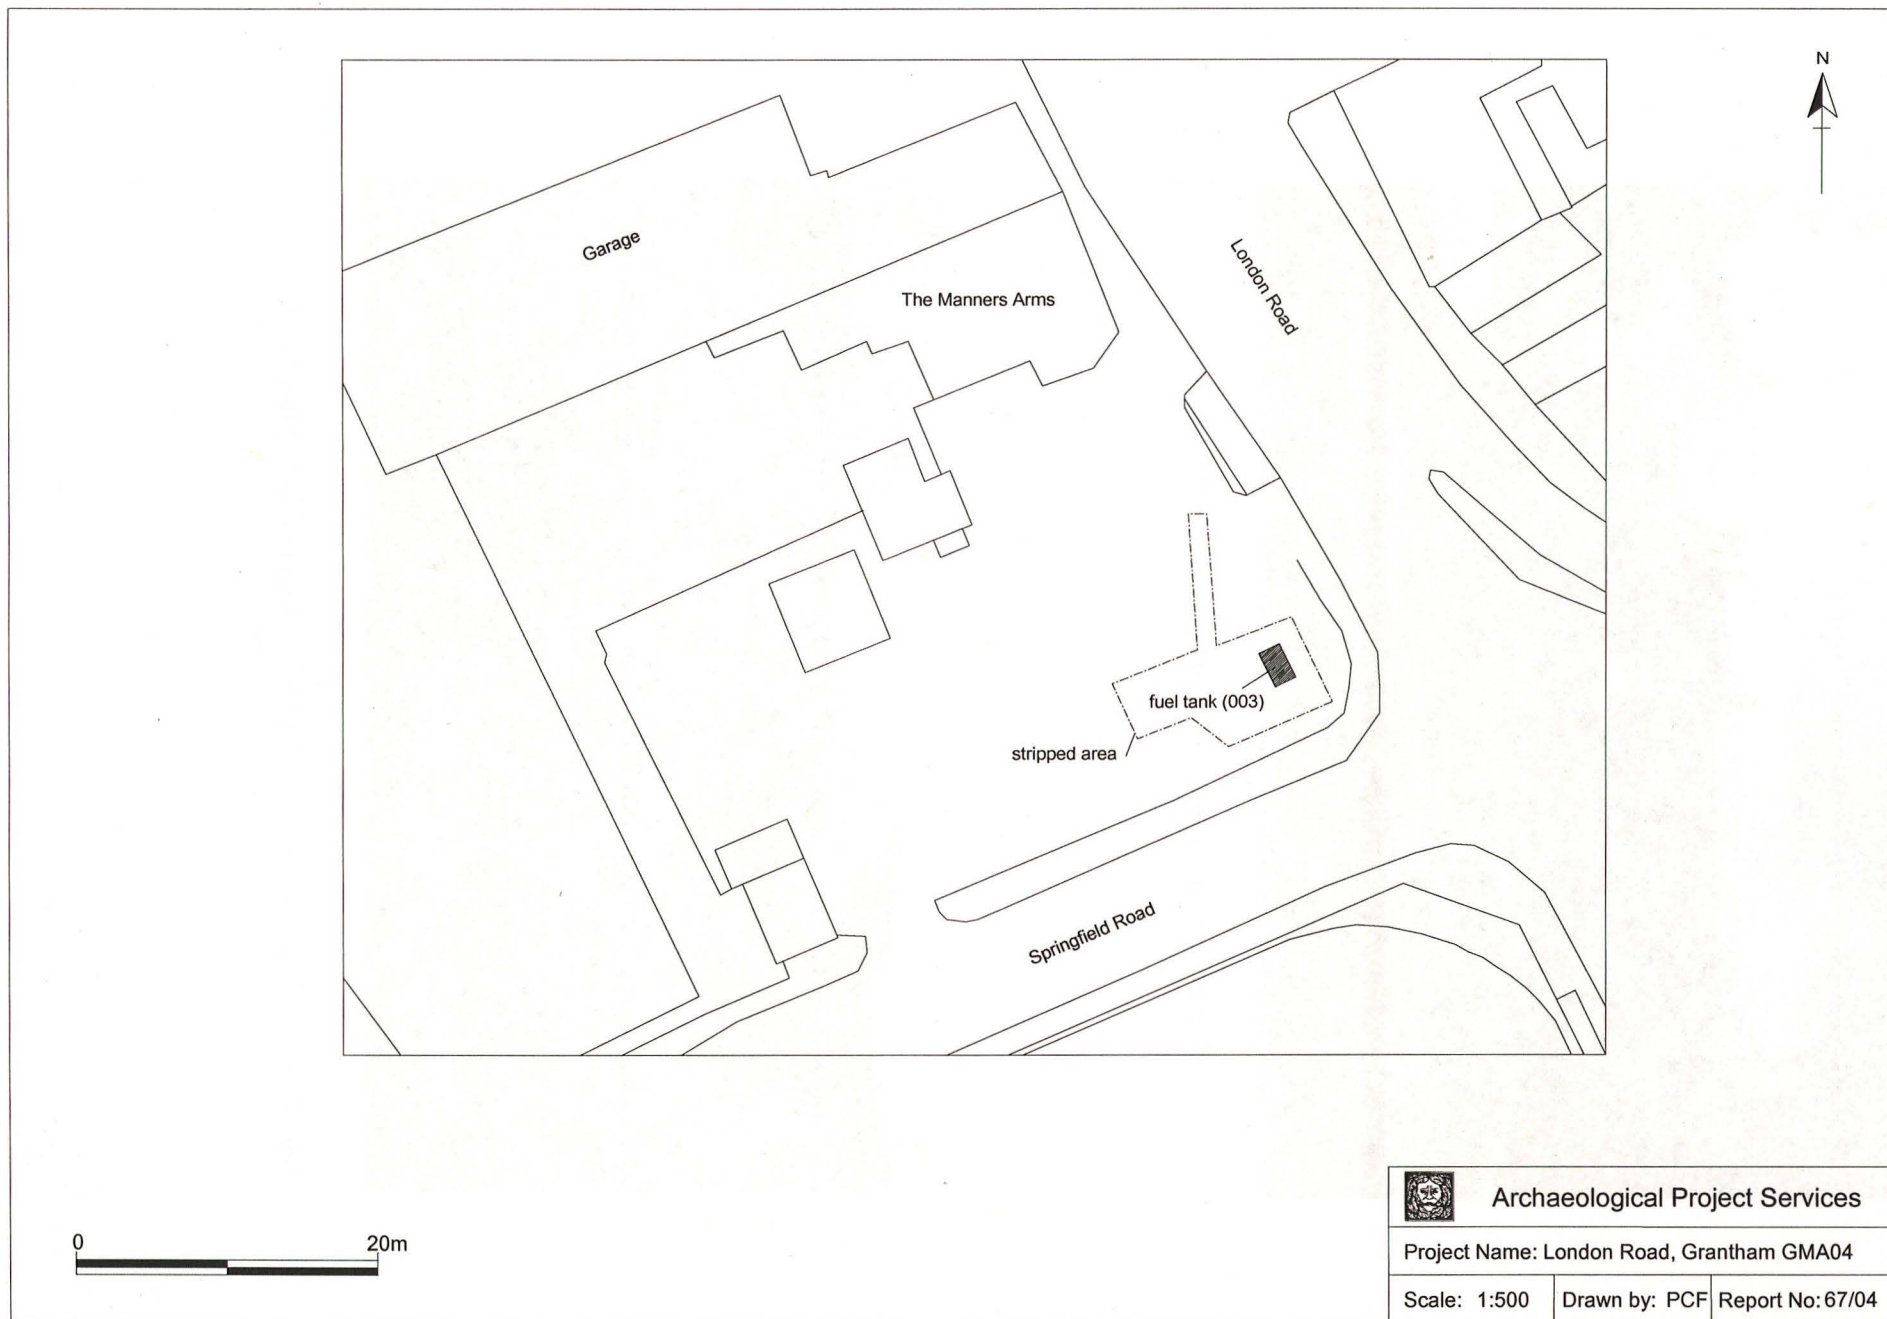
Plan of the development showing location of stripped area and fuel tank
